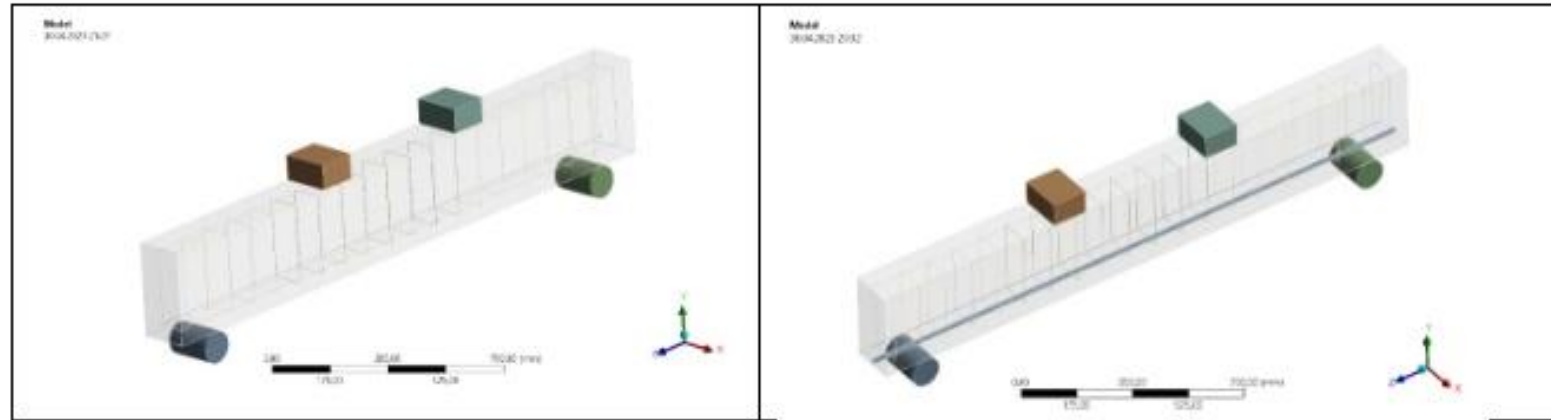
RC beam models for control beam (left) and NSM FRP beam (right)
